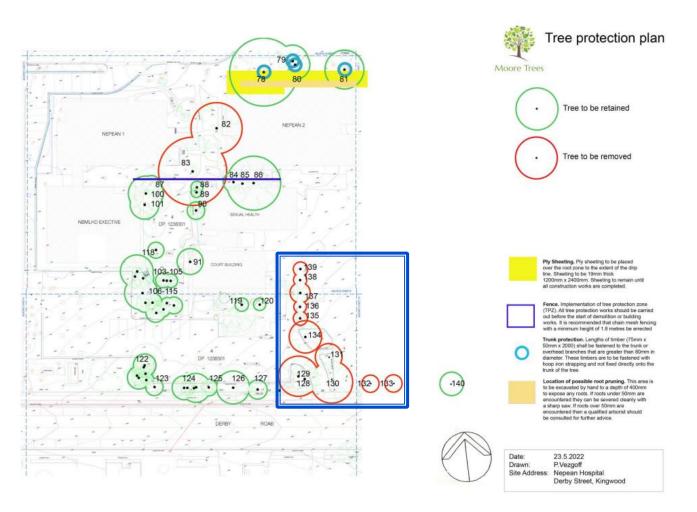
Tree Protection Plan – with TAM Building works location shown with a blue boundary (Moore Trees)
